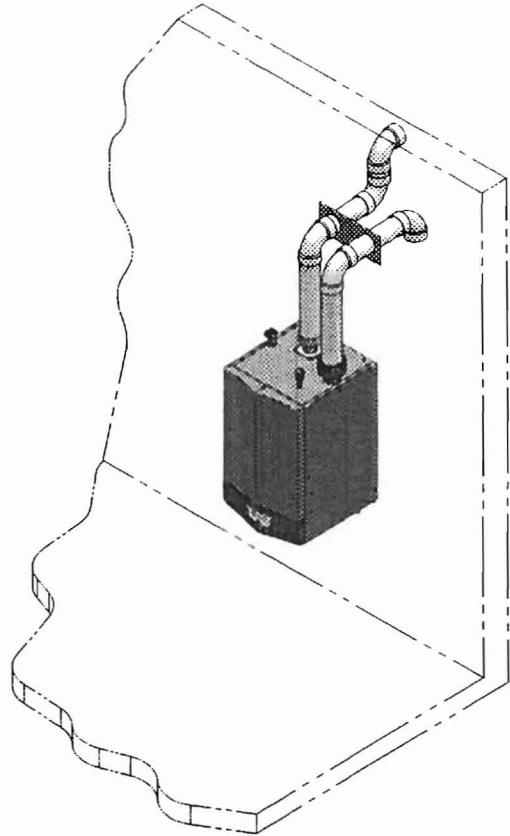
Two-Pipe Sidewall Termination - See page 17 for more details
